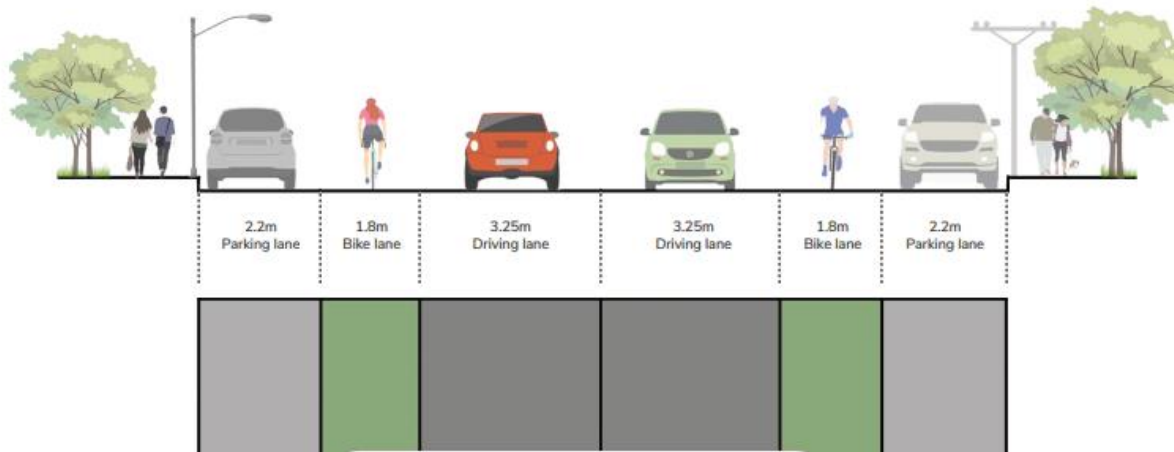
Cross section of existing conditions on typical mid-block section of Victoria Street.
